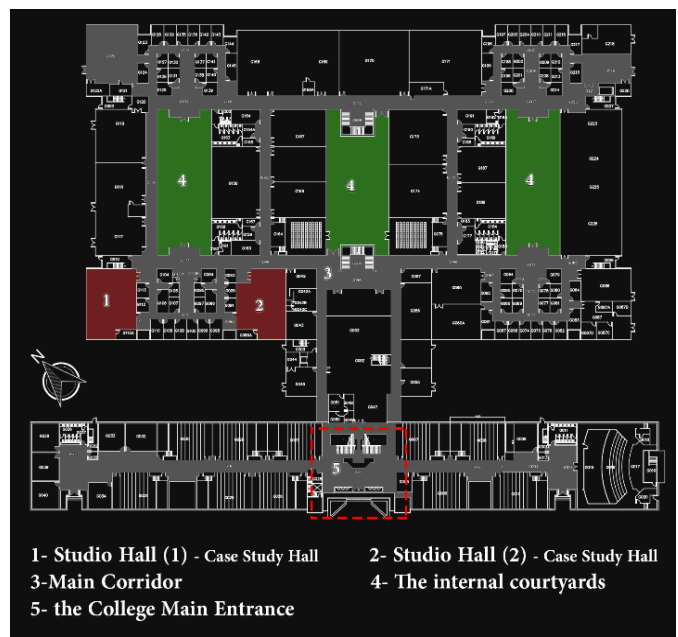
(the faculty ground floor plan demonstrating the case study: studio halls 1,2) (Umm Al-Qura University projects administration, 2020)
